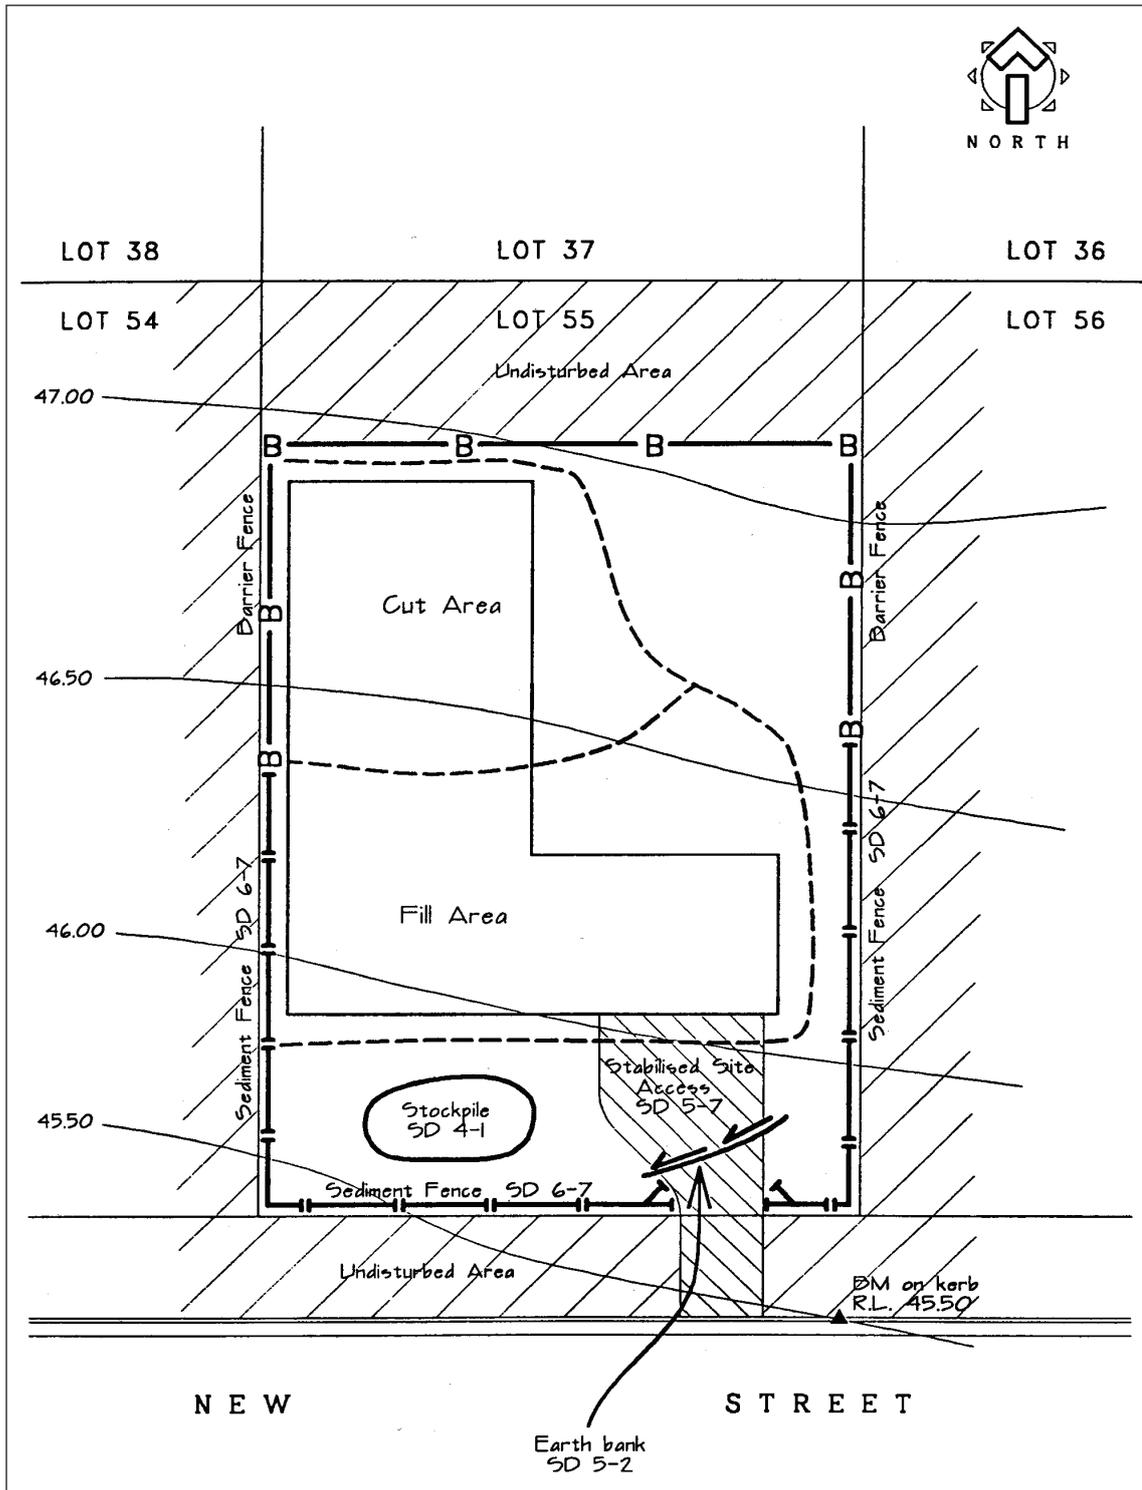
Typical detail for a residential erosion and sediment control plan (ESCP)
